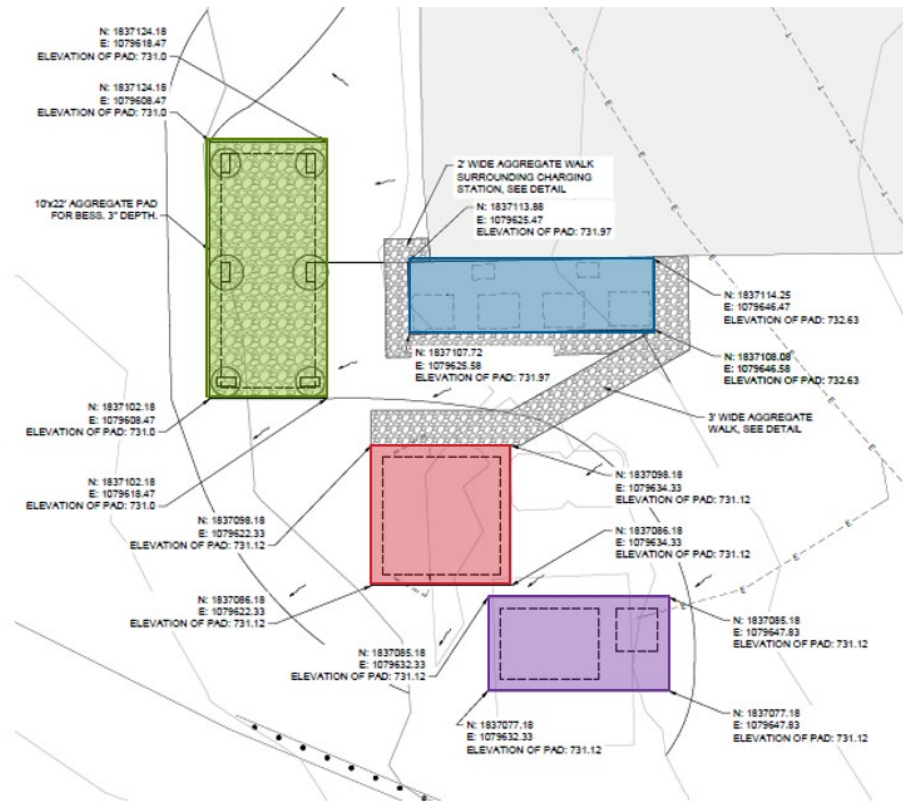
Site Layout Plan for eXtreme Fast Charging Station on the Smart Energy Plaza
